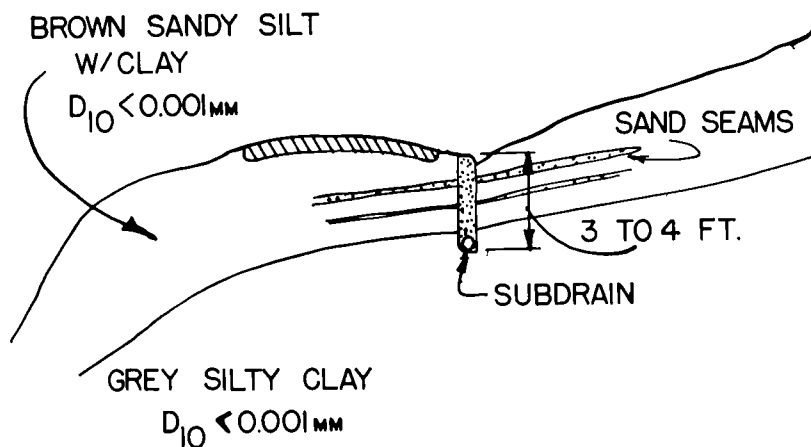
Cross-section at subdrain Site 1 showing the single longitudinal subdrain.
